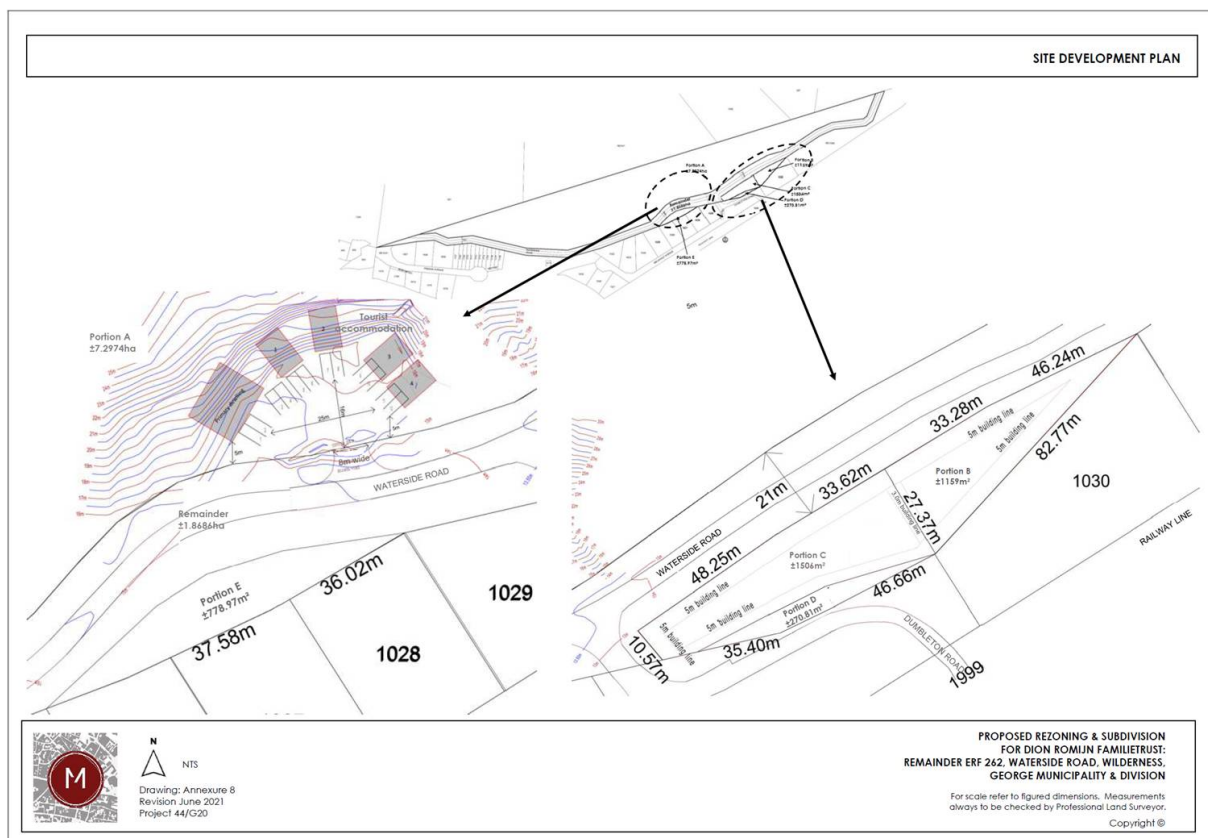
Final and current Site Development Plan for Remainder Erf 1262, Wilderness. Courtesy of Marlize De Bruyn Planning and the applicant. (A4 version on pg 54)
